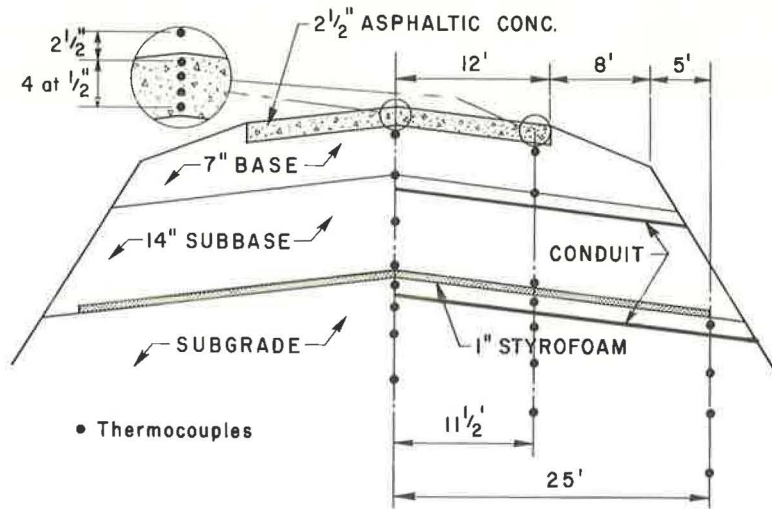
Instrumentation and cross-section of section 2, Midland, Mich.
